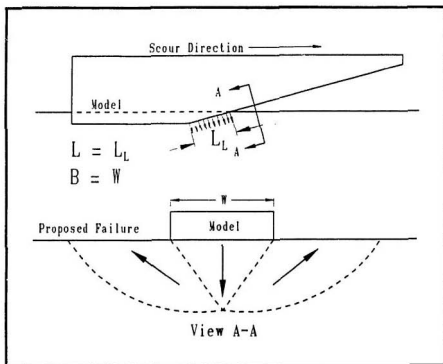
Potential Bearing Capacity Failure Through Direct Model Loading, Mechanism 4.
